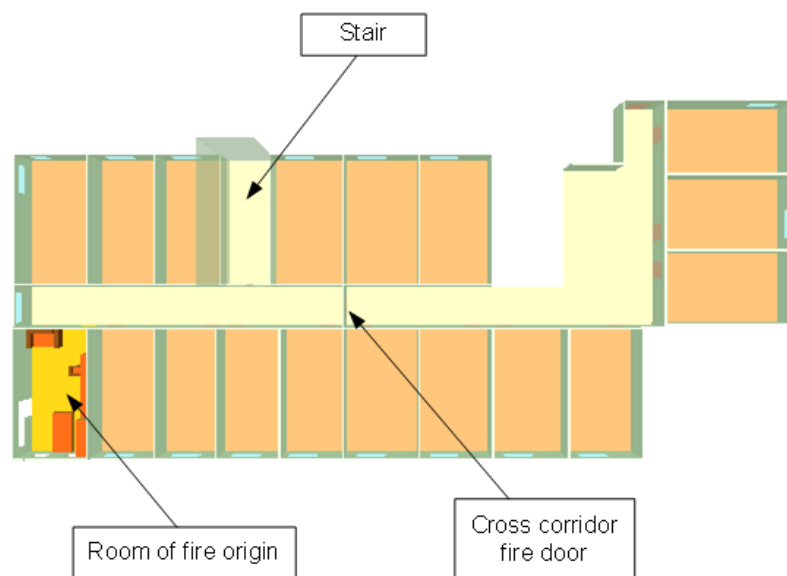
General layout of the model (for both the sprinklered and unsprinklered cases)
